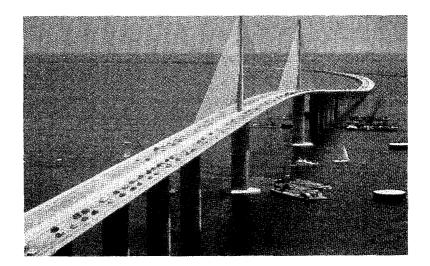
Fly ash concrete improved both the fresh and hardened concrete properties in the decks and piers of Tampa Bay's Sunshine Skyway Bridge.
